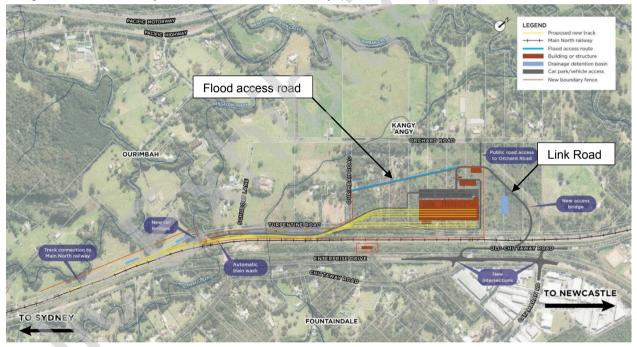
New Intercity Fleet Maintenance Facility (Reference 14) – Flood Access Road
